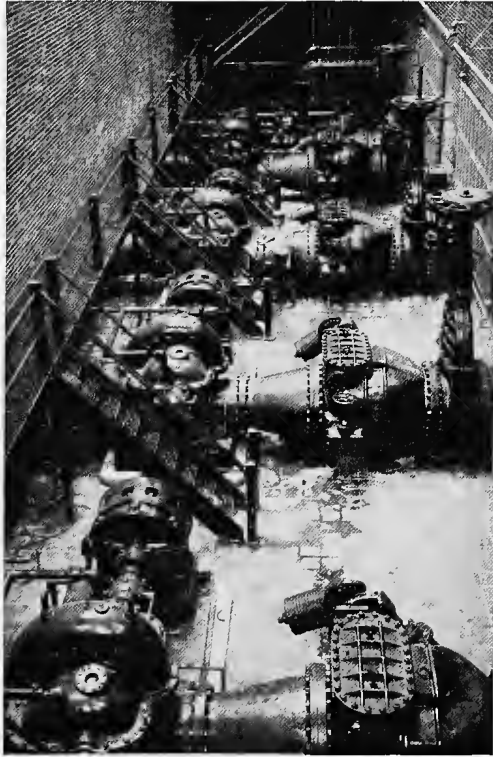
Return-sludge pumps at North Side plant, Chicago.
